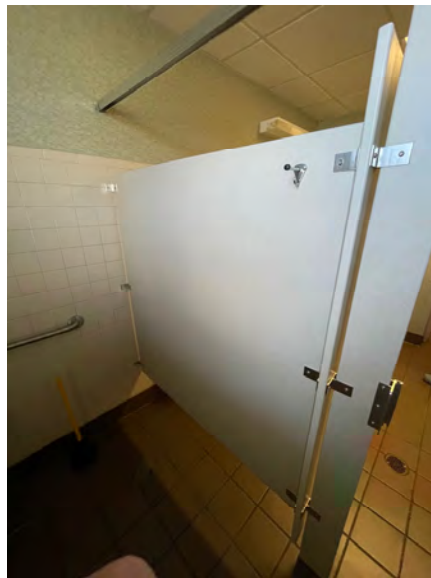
Jamestown Civic Center Men's Toilet Room Coat Hook
